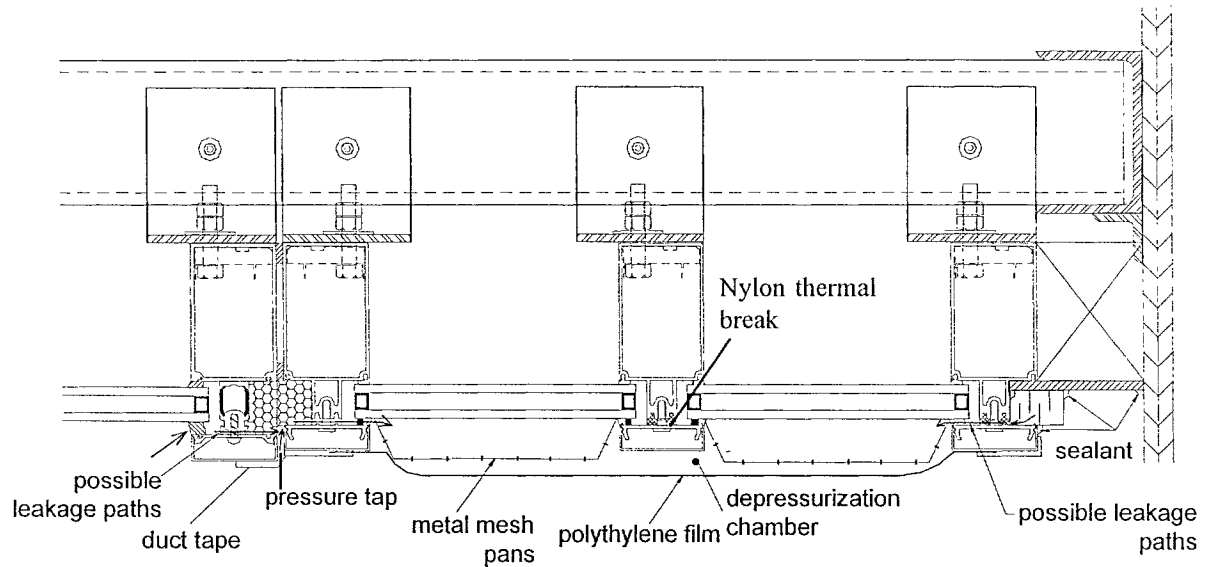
Details of the depressurization chamber (horizontal section, not to scale)
